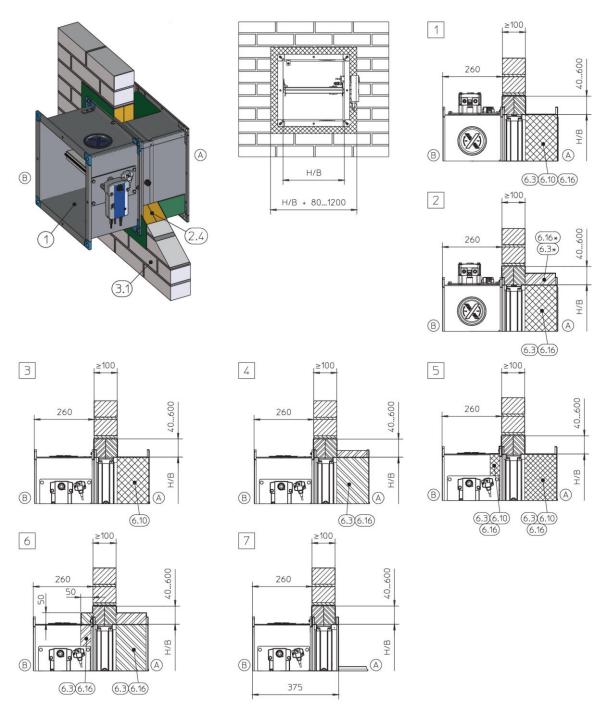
Dry mortarless installation with fire batt into a solid wall
